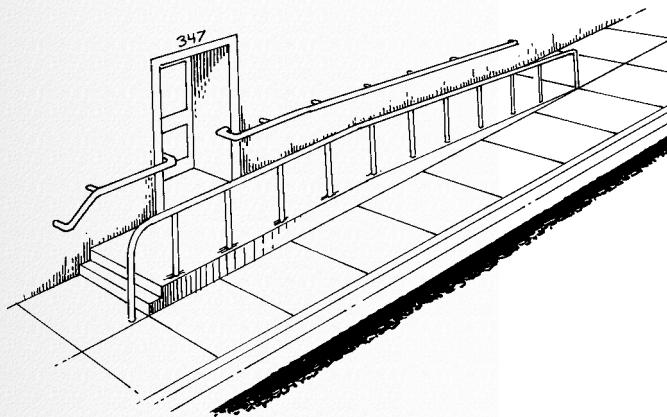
GOOD DESIGN: This sidewalk has been ramped to provide access to the building entrance. This creative design is possible only on wide sidewalks where pedestrians will be given the option to either continue in a straight path or enter the building using the ramp or stairs.
